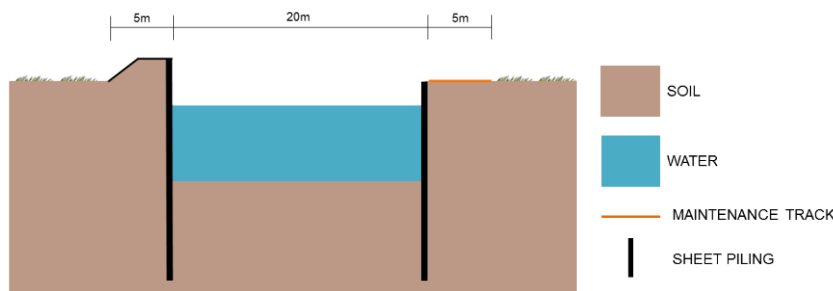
Typical cross-section of the flood relief channel through landfill sites.
